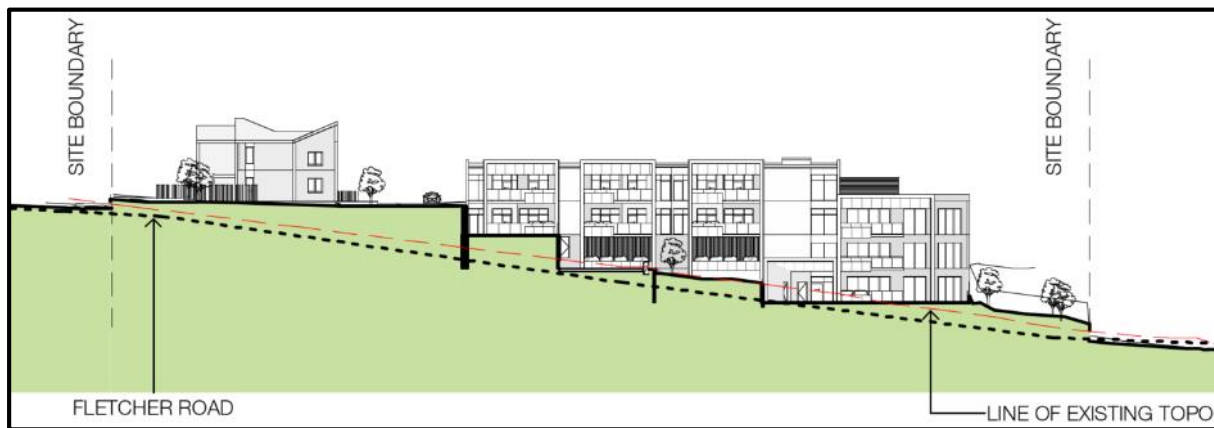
Fletcher Road (north) elevation (Attachment 4 Plan TP013)
